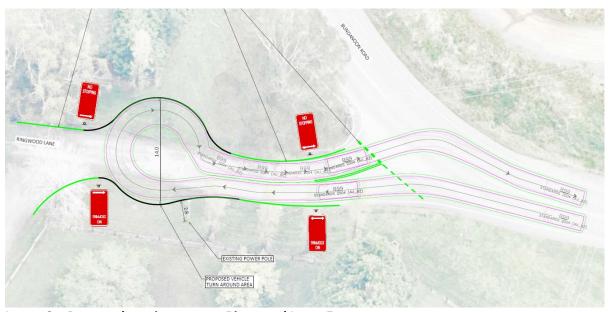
Proposed turning area on Ringwood Lane, Exeter
